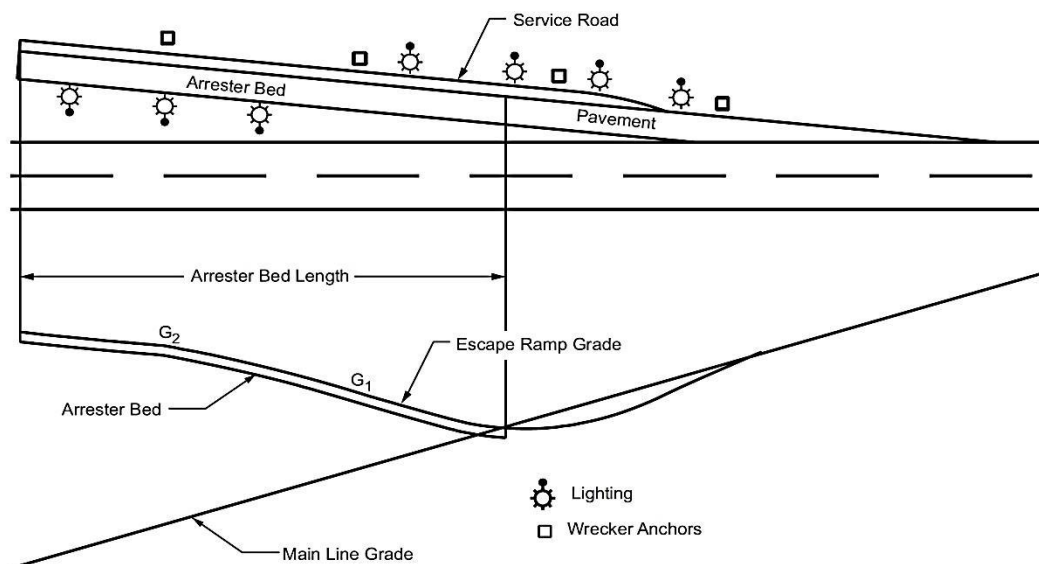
/2: Typical Emergency Escape Ramp [1, p.3-148]
